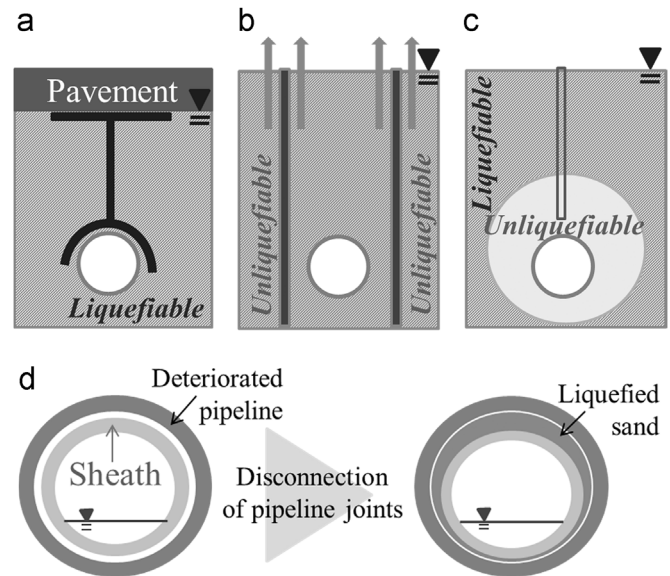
Proposed mitigation measures without overall excavation: (a) horn-like structure, (b) vertical drain pipes, (c) chemical grouting, and (d) insertion of sheath pipe.
